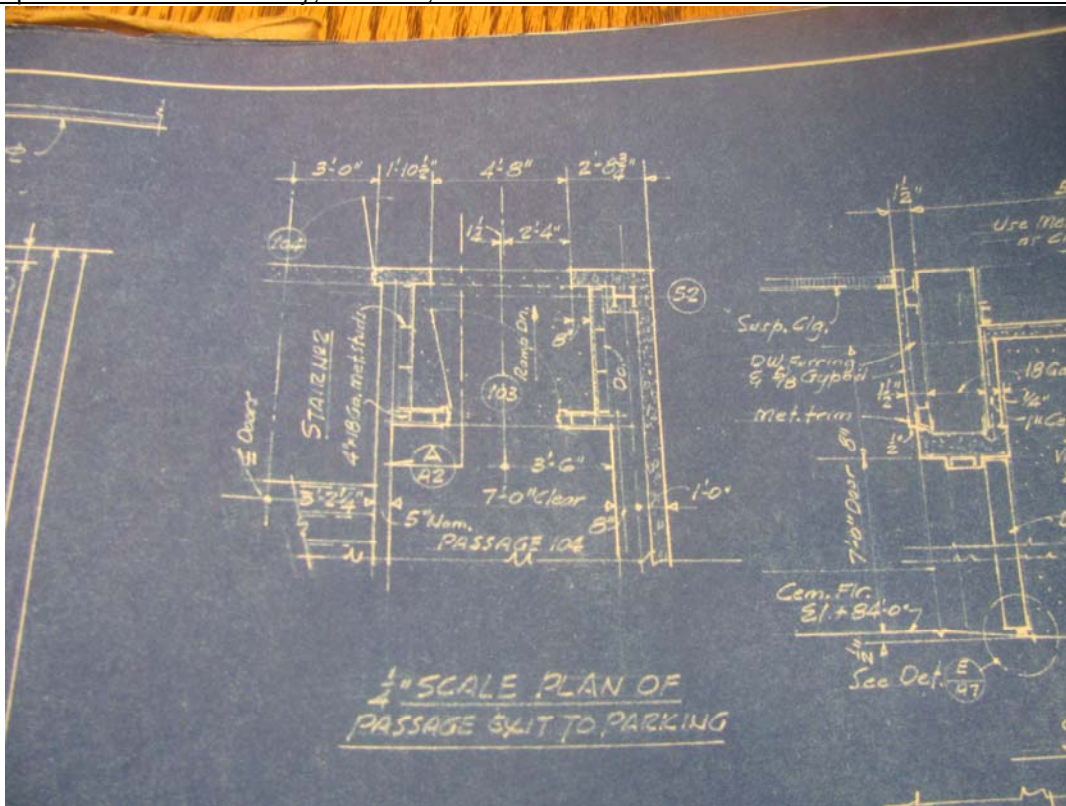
Blueprints for Red Cross Building, exit towards Glovatorium
